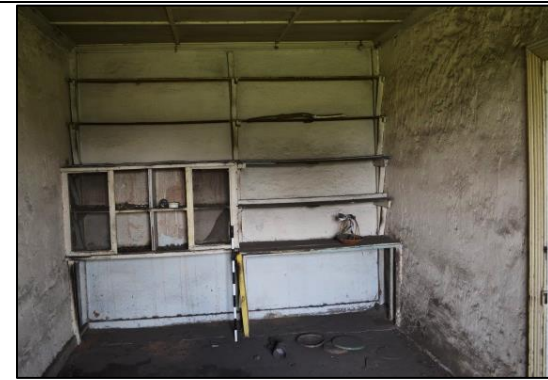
Shelving and racking in the pantry. this room may have been used as a breakfast room (Photograph: M. Naude 2016).
